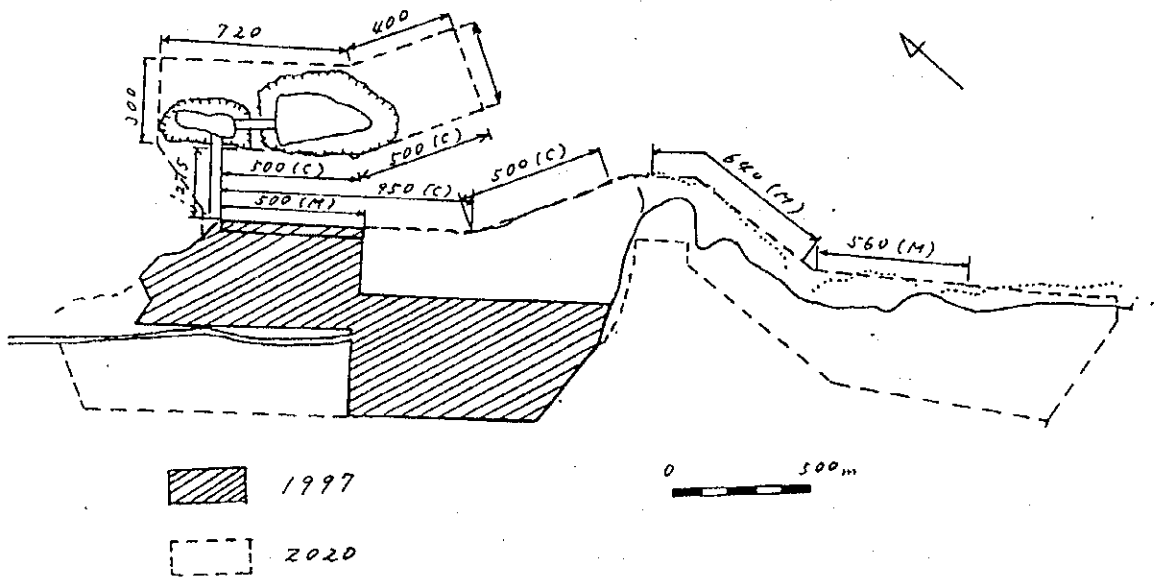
Existing Container Terminal Development Plan (3): Bojonegara (West Jawa)
